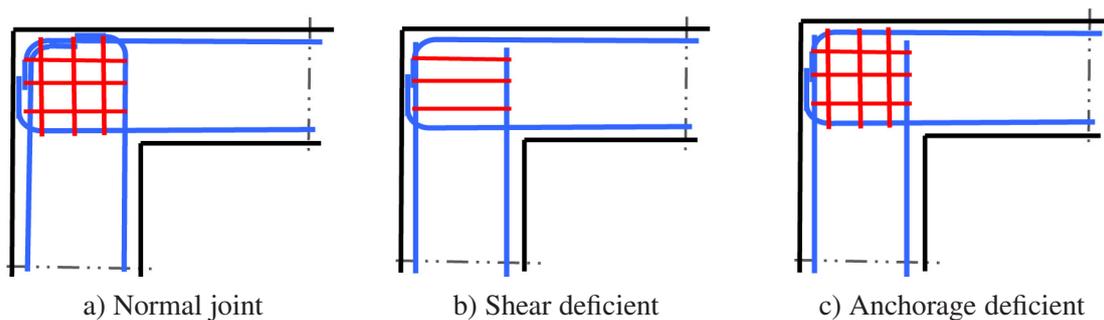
Beam column knee joint with proper and improper reinforcement details
